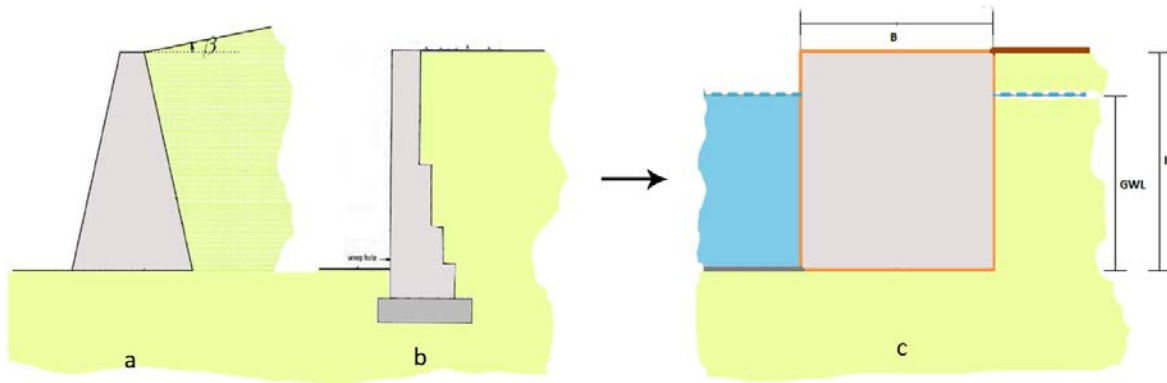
a. Gravity retaining wall, source: (Vardon, 2015), b. Brick retaining wall, source: (Haseltine, 1991), c. Concept design
